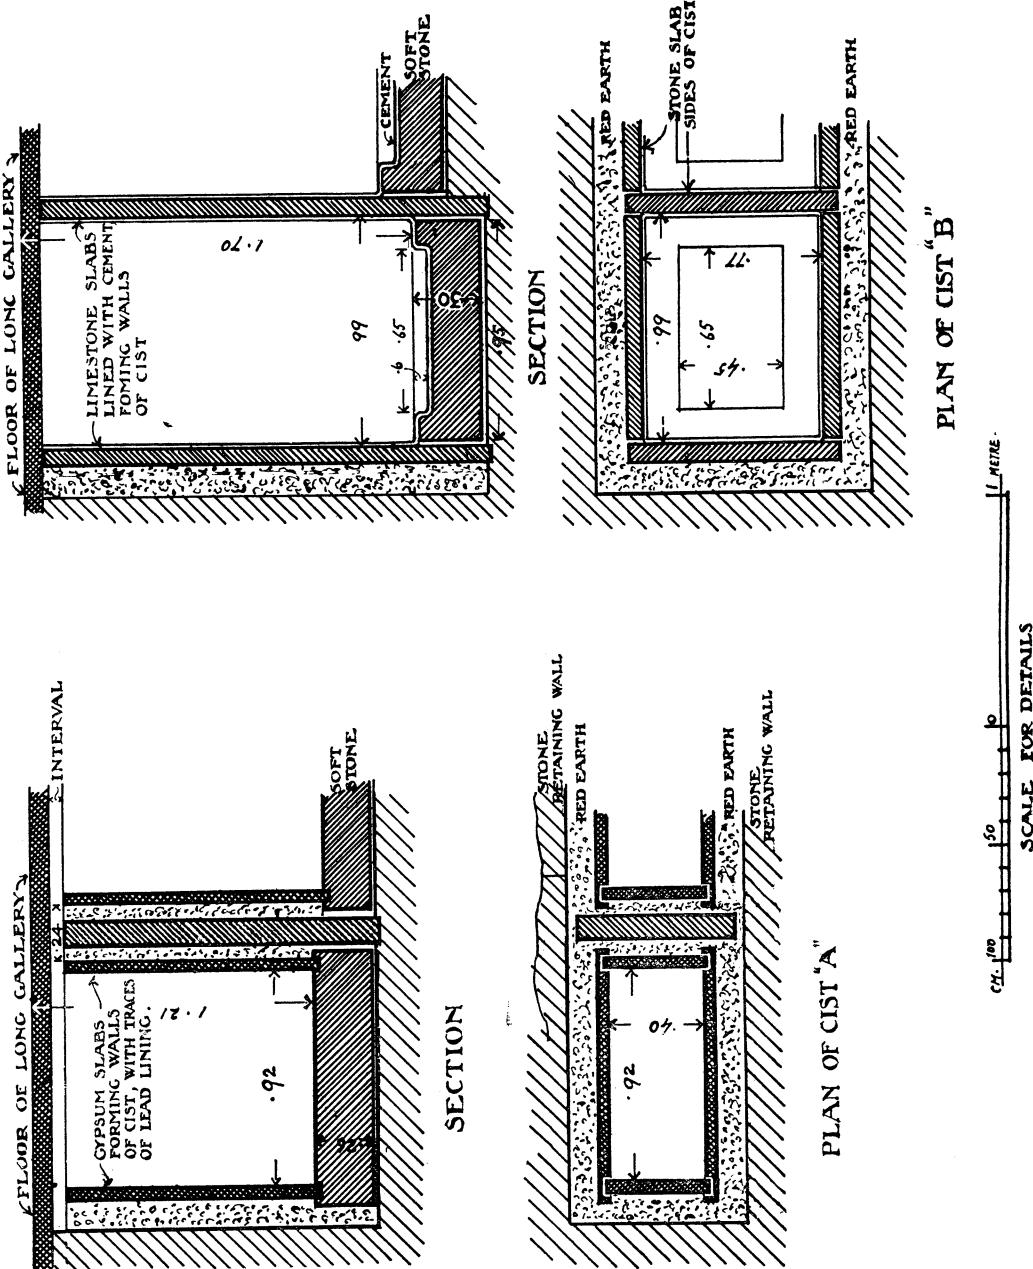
SECTIONS AND PLANS OF 'KASSELLES' OF LONG GALLERY.
